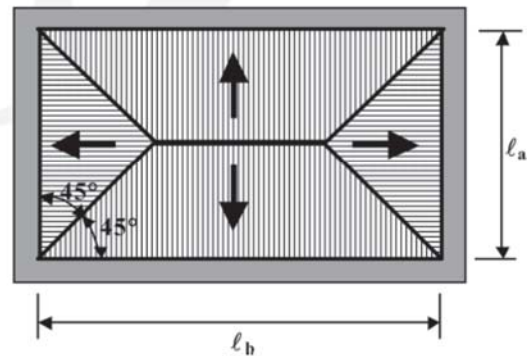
Tributary areas for minimum shear at the supports of two-way slabs supported on girders, beams, or reinforced concrete walls.
